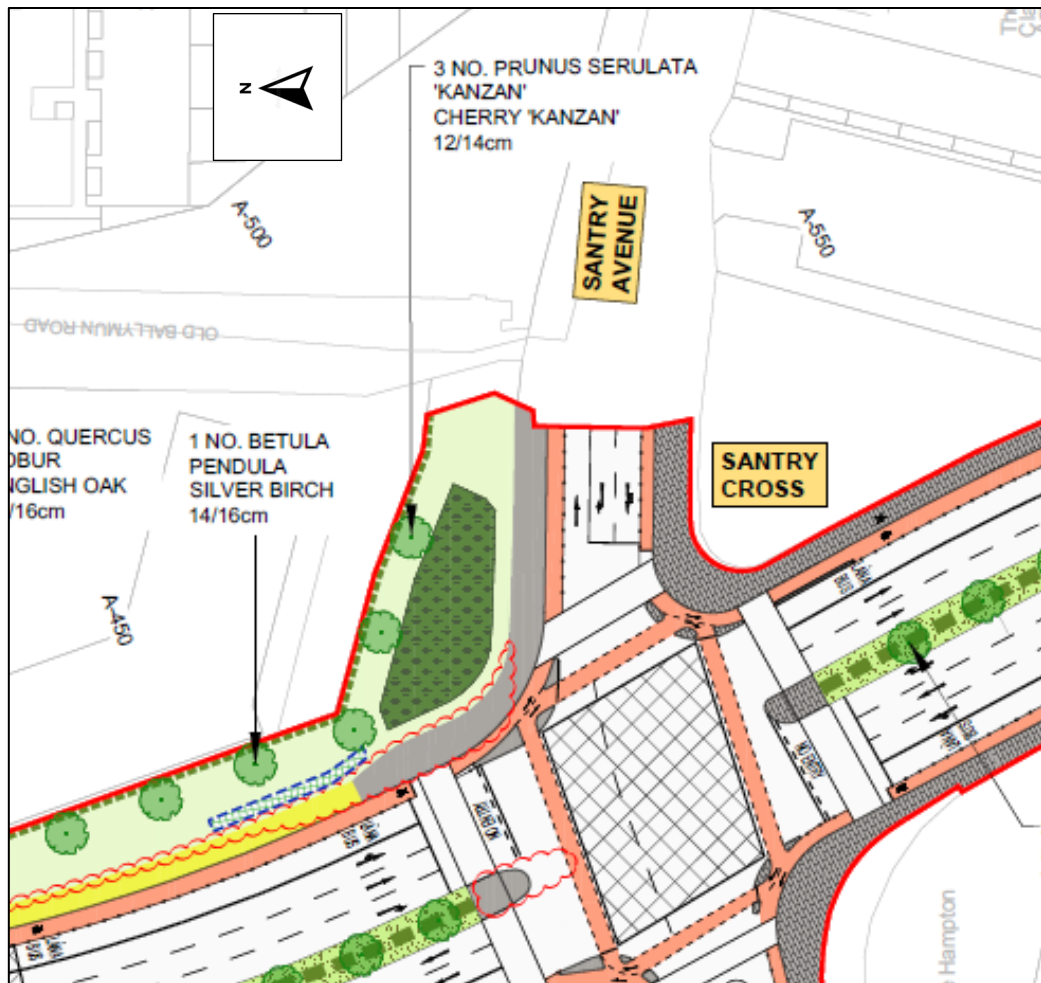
Extract from Landscape General Arrangement Drawing Sheet 2 at Santry Cross
